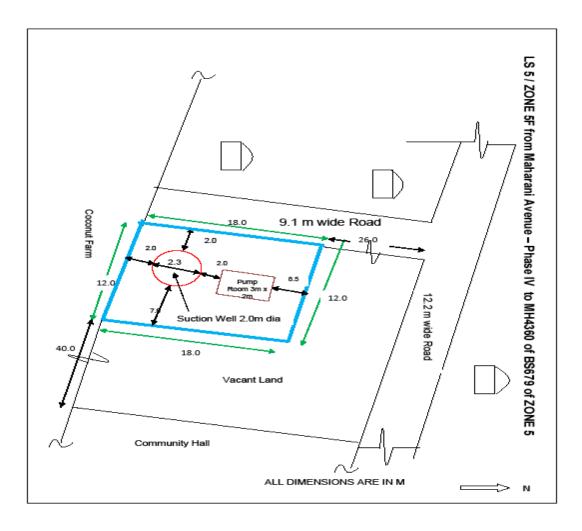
Site Set out Plans – Zone V (Maharani Avenue)
